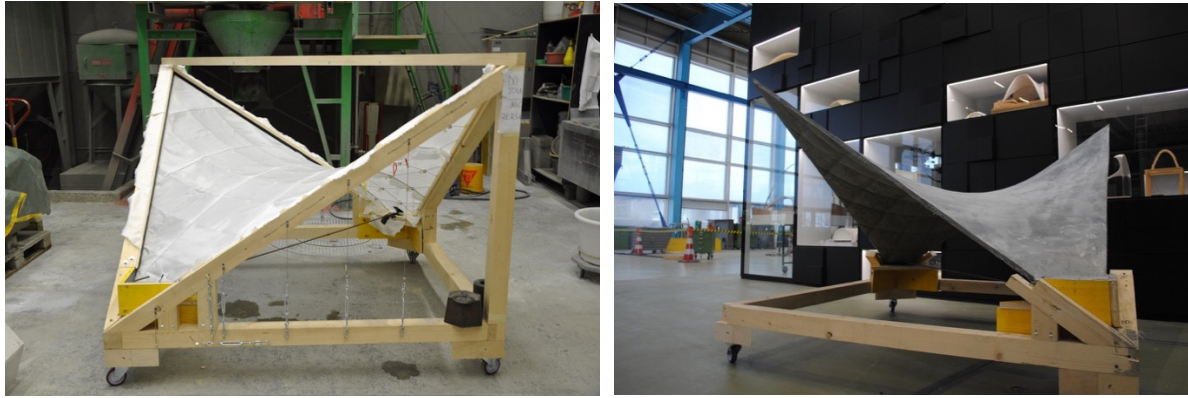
Model of the use of cable stayed fabric formed hyper-paraboloid shell prototype. Tensile cable net formwork (Copyright: Diederik Veenendaal)
